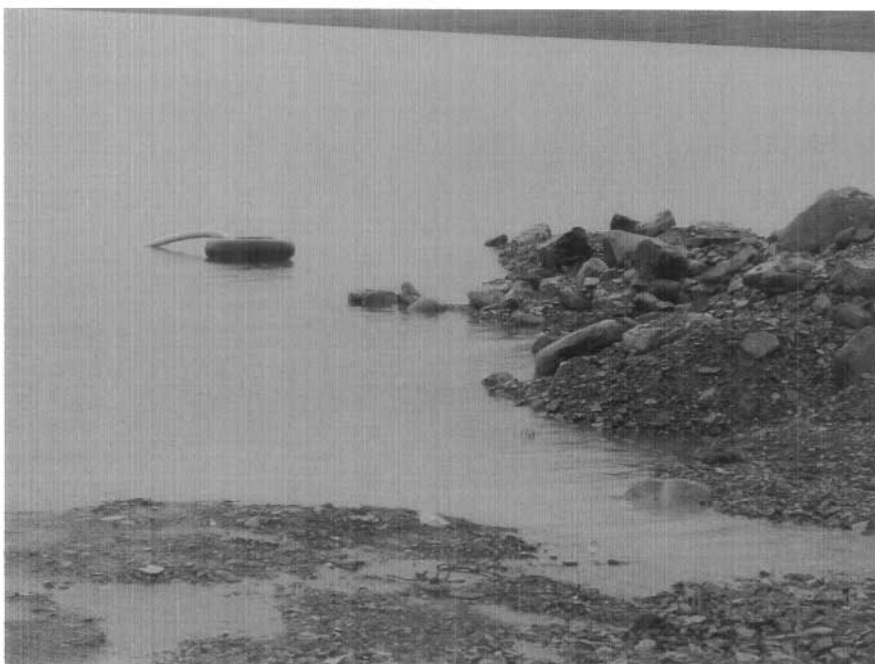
Auxiliary truck fill intake at Water Intake Facility
